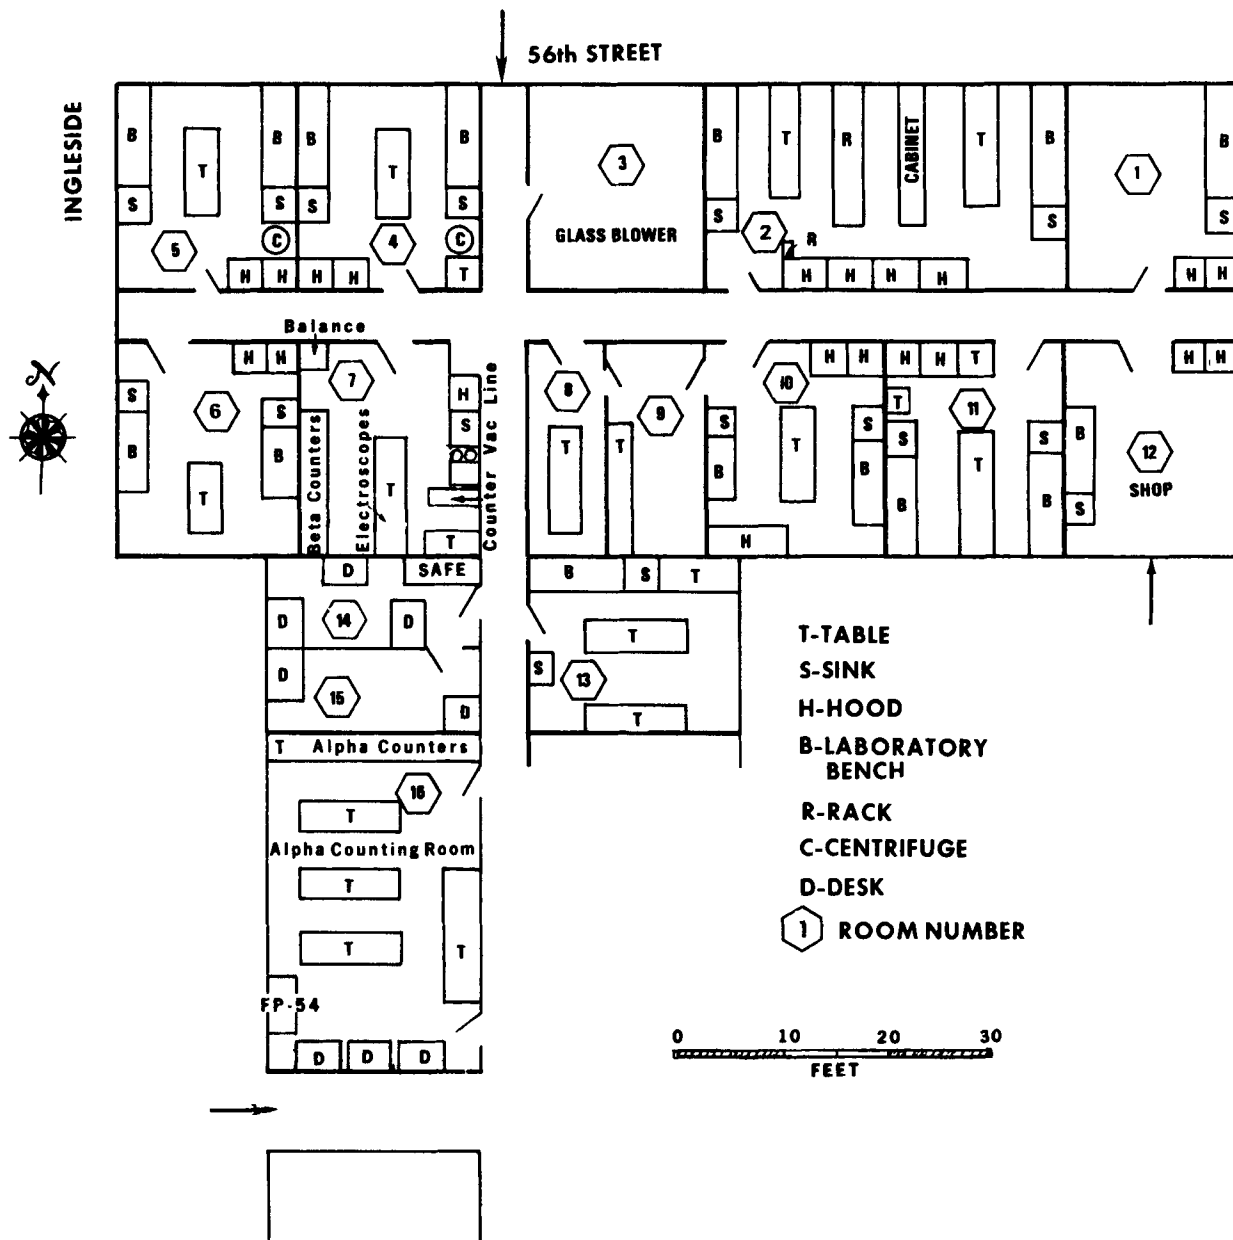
Floor plan and layout of laboratory benches, hoods, facilities, etc., for Section C-I in New Chemistry Building, end of April 1943. (XBL 758-3805)
